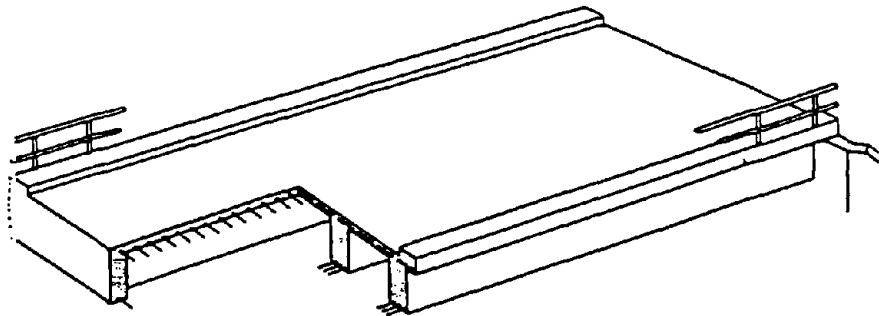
Reinforced Concrete Deck-Girder Bridge (Winter & Nilson 1979)
